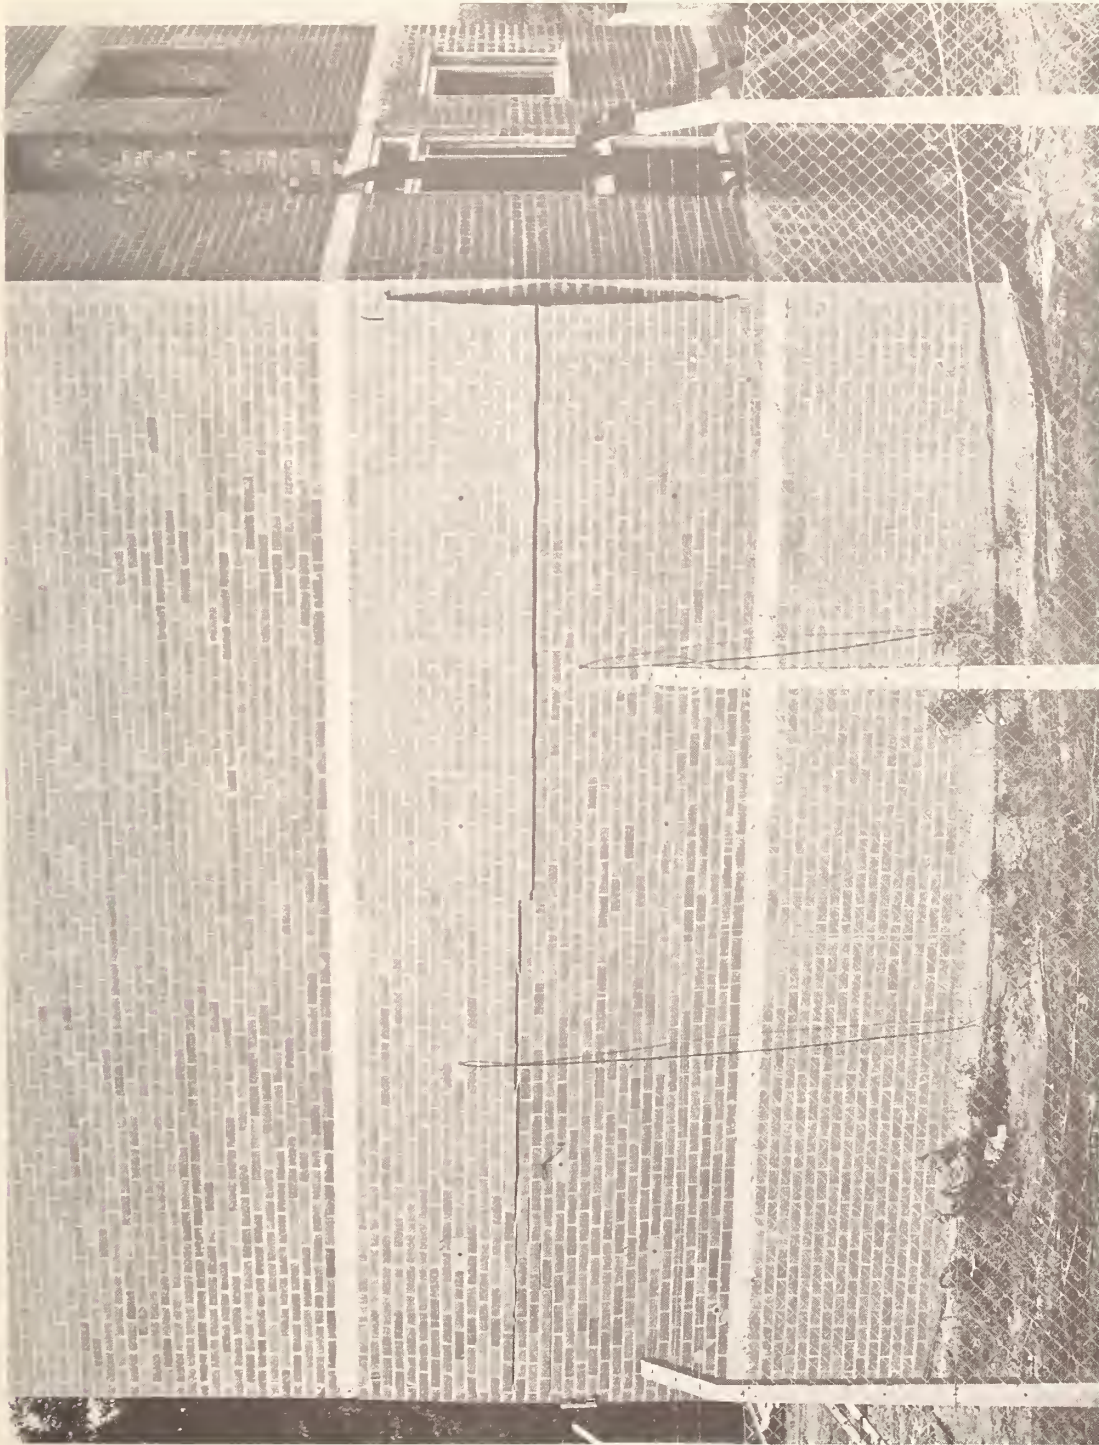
Round 49: damage to outer leaf of gable wall of Rooms 1 and 2, showing large vertical crack at rear
